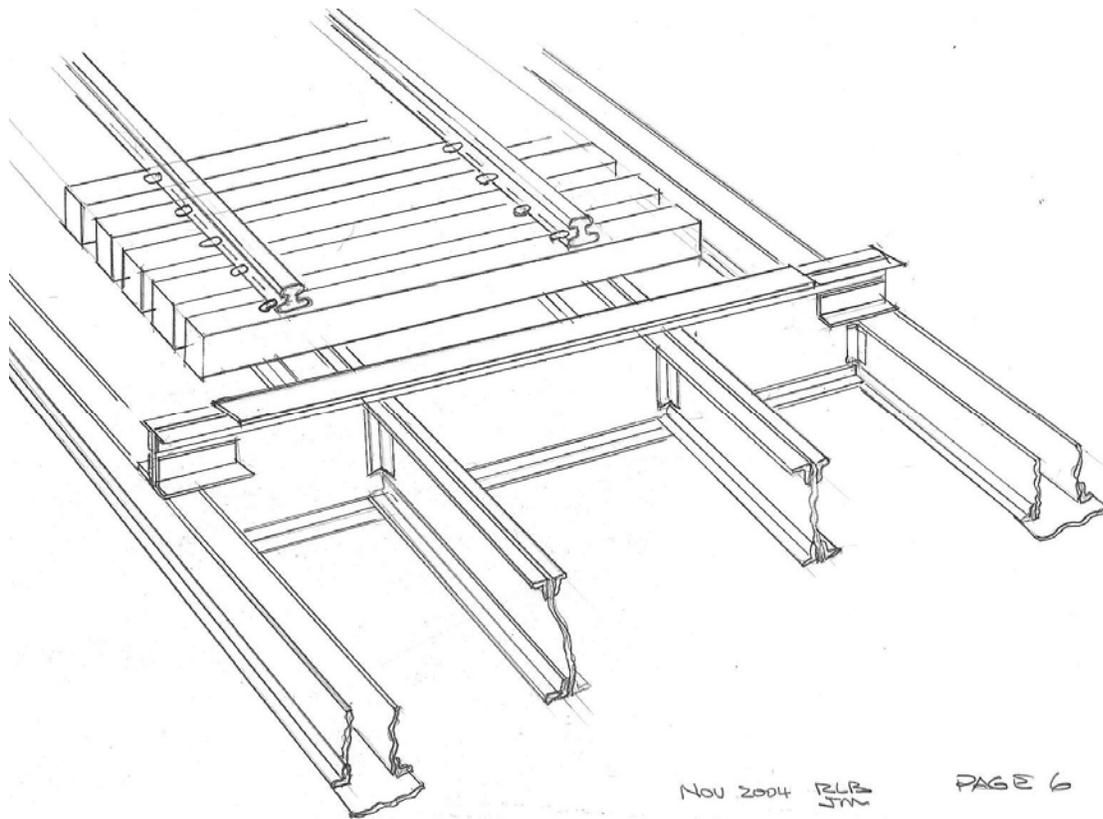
Underside of Smoky River Bridge and Floor-Beams
